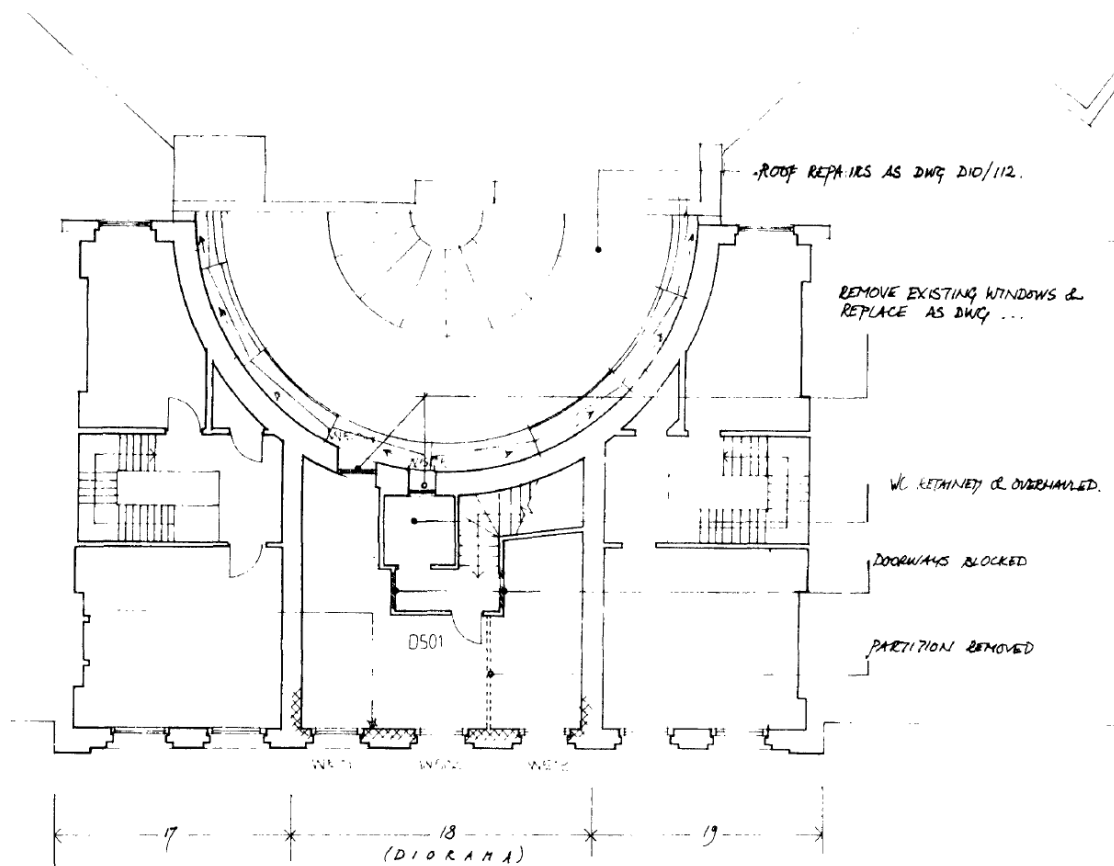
Proposed third floor of nos. 17-19. Camden planning ref: HB/9370268.
